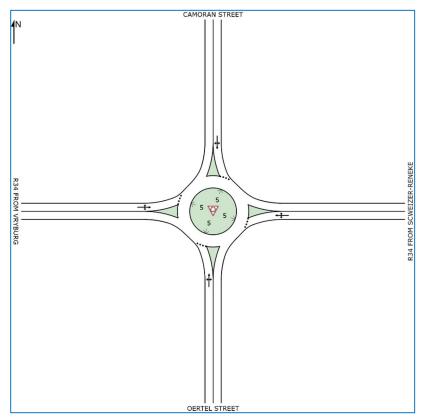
Proposed Layout of R34, Oertel Street and Cameron Street – Intersection 3
